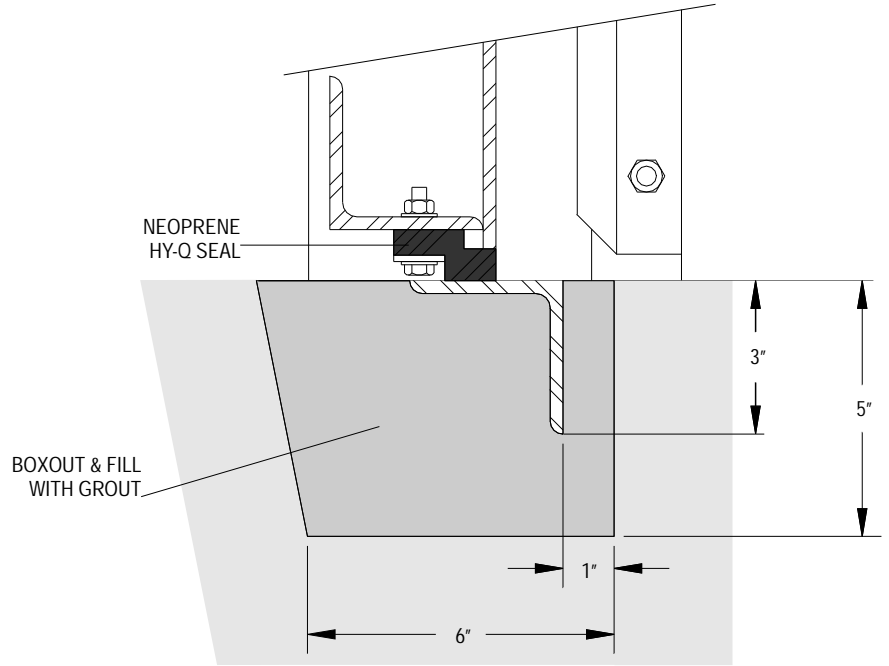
723- Stainless Steel Embedded Frame In-Channel Mounting with HY-Q Seal; Section BB
